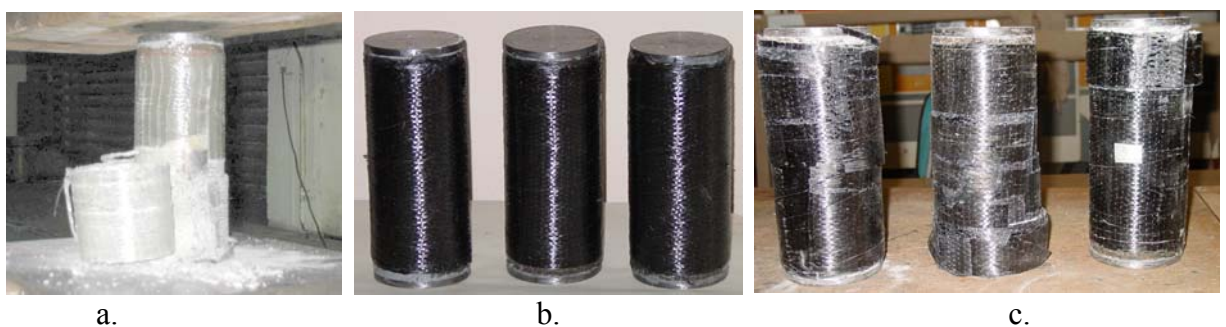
Failure modes: a. concrete destruction and explosive rupture of GFRP at the lower part of specimen b. CFRP concrete specimens initial stage (before loading); c. explosive failure modes of the concrete specimen in case of wrapping with 3 CFRP layers
